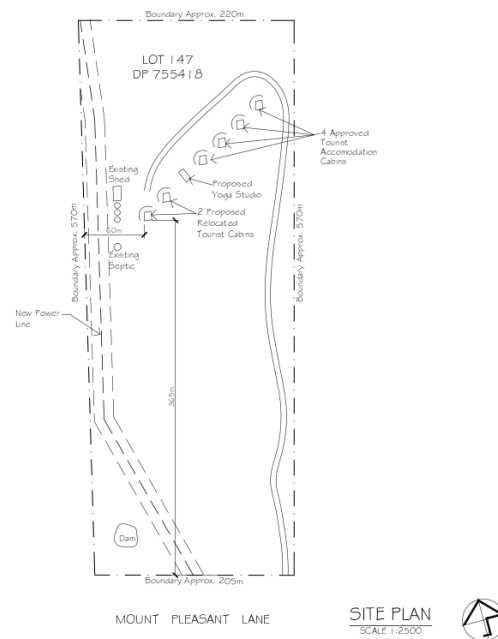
LAYOUT (GISSELLE DENLEY DRAFTING SERVICES)
